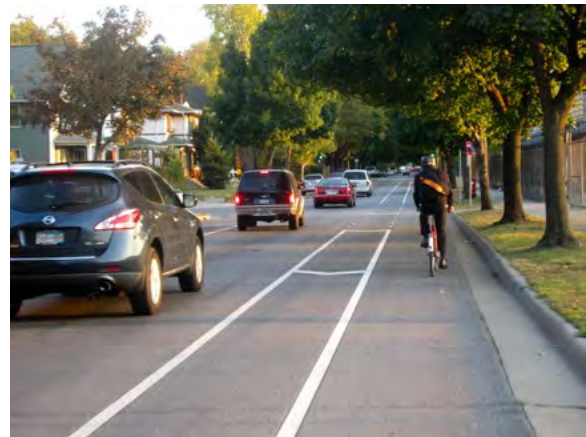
A bicyclist riding on Fremont Avenue North at 18<sup>th</sup> Avenue North after installation
